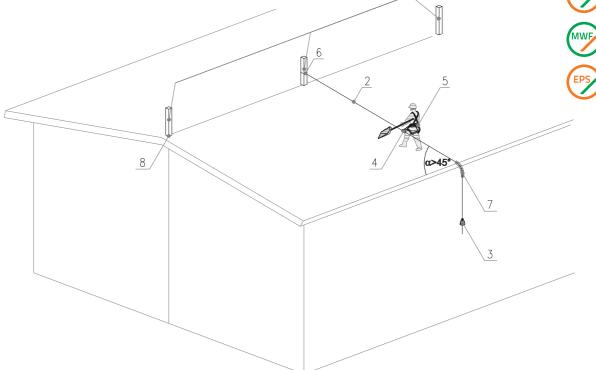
IzoRoof PIR/PIR+; MWF; EPS - roof maintenance systems
